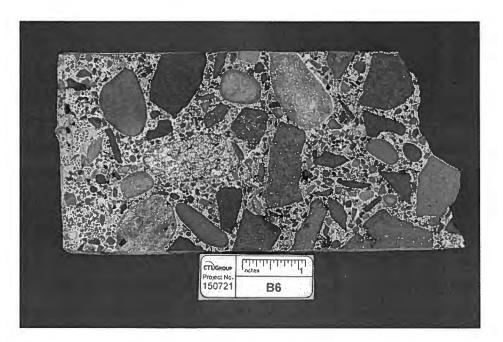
Cut and lapped section of Core B6. Exterior surface at left.
